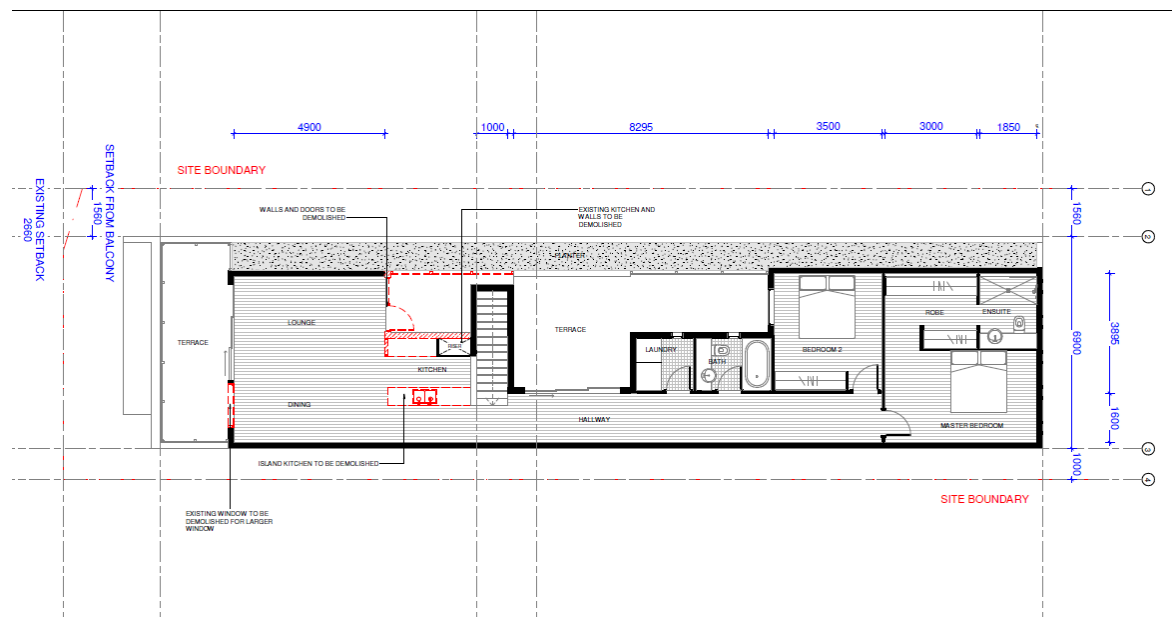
Demolition plan – Upper Floor Apartment 7 (changes in red)
